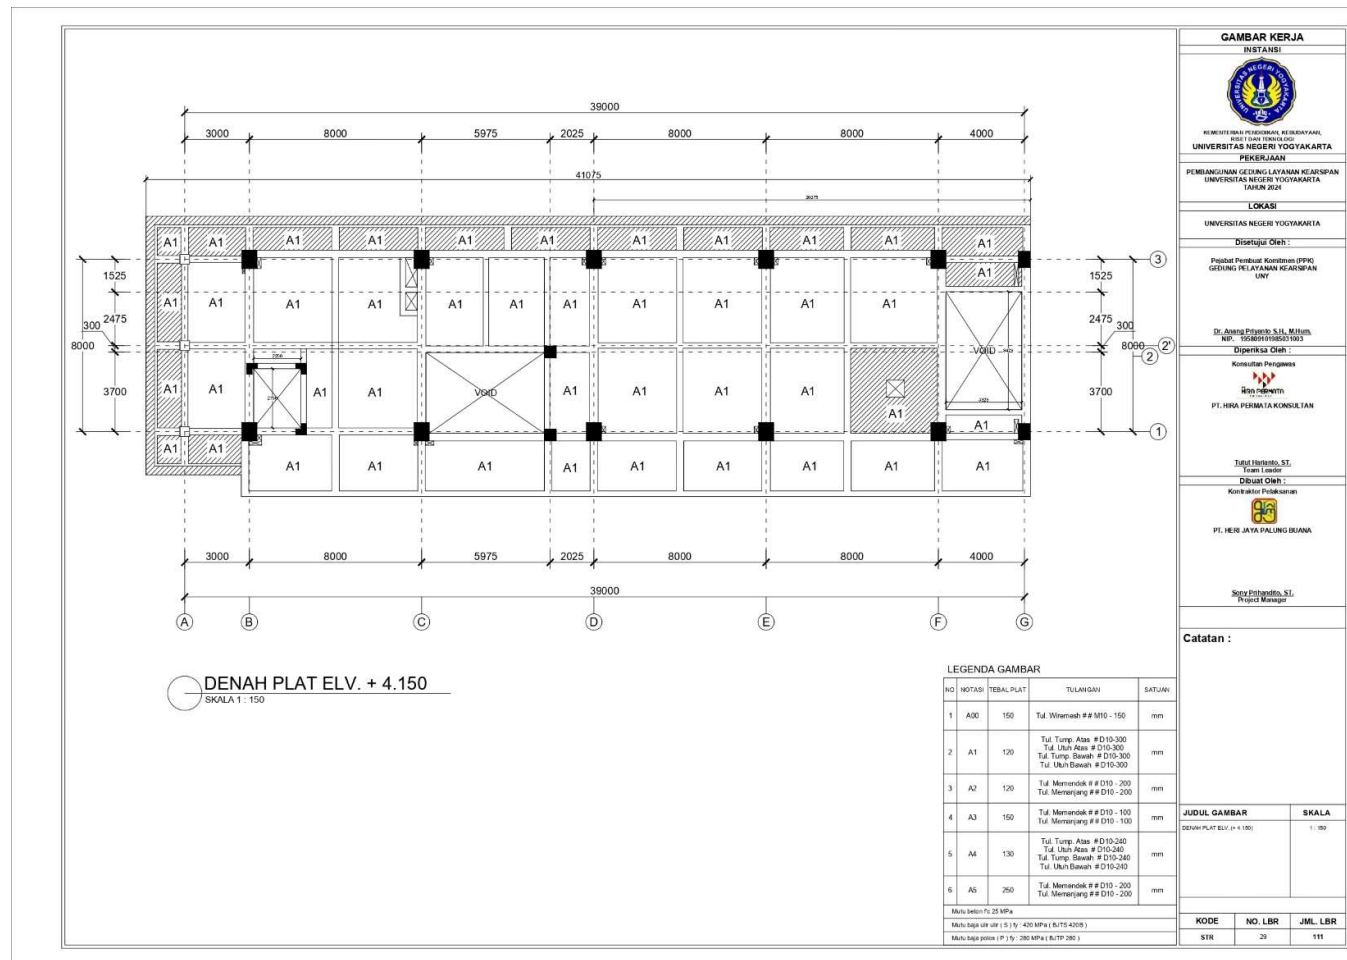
11 Slab Site Plan of Elv. +4.150
